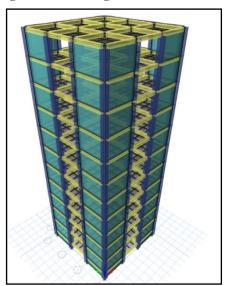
Steel frame with RCC slab and CLT slab building with CLT shear wall
